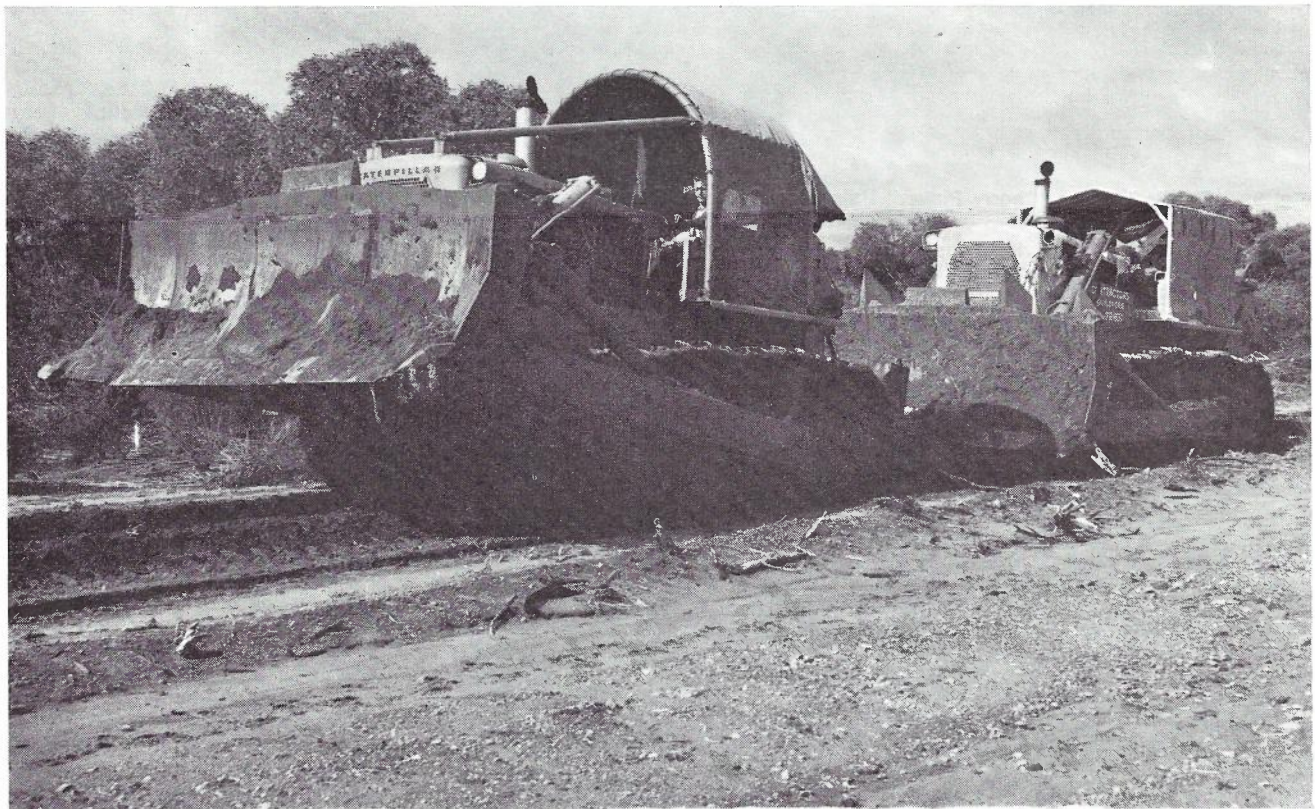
Caterpillar D9G Tractors Ripping in Tandem. The Kelley equipped machine is in front.
